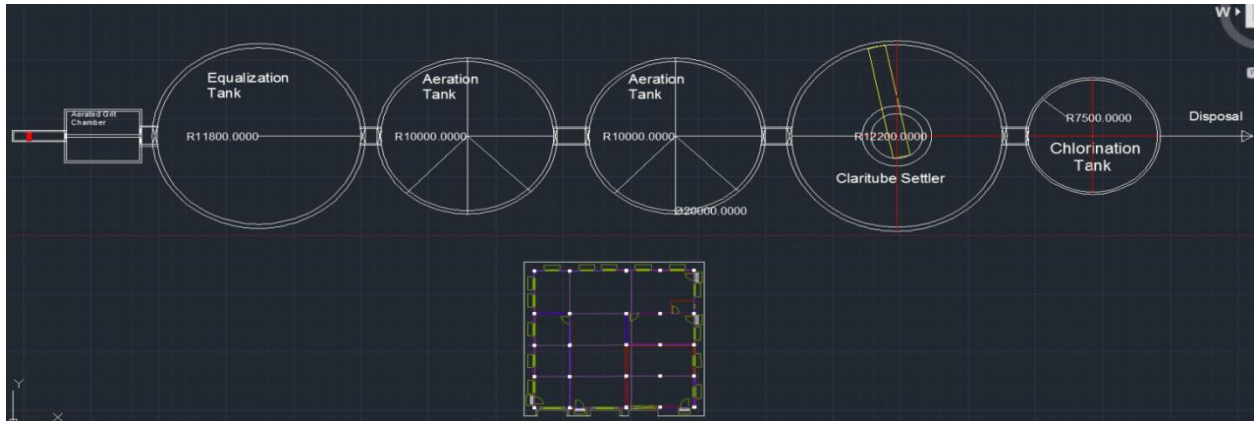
AutoCAD Drawing/ Layout for Proposed STP
